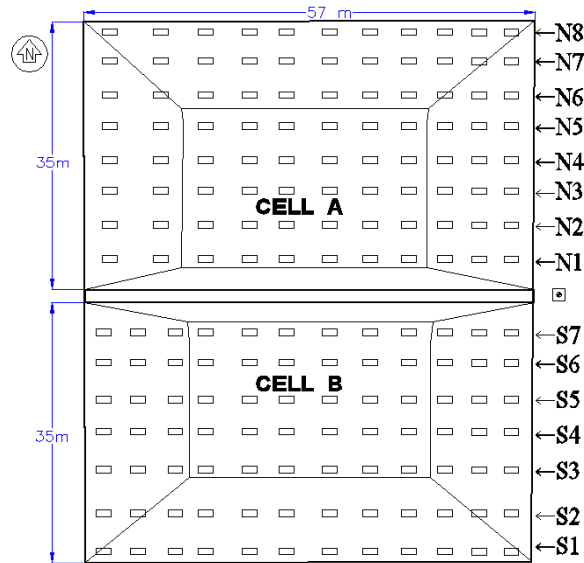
Plan of Tehran Pilot Scale Landfill Illustrating the Position of Surface Benchmarks
